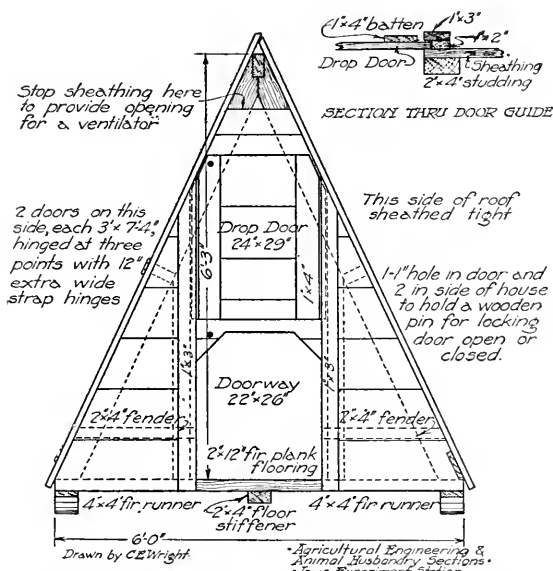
"A" House (Doors Hinged at Side). Front end elevation. To make doorway larger build house higher and wider.
